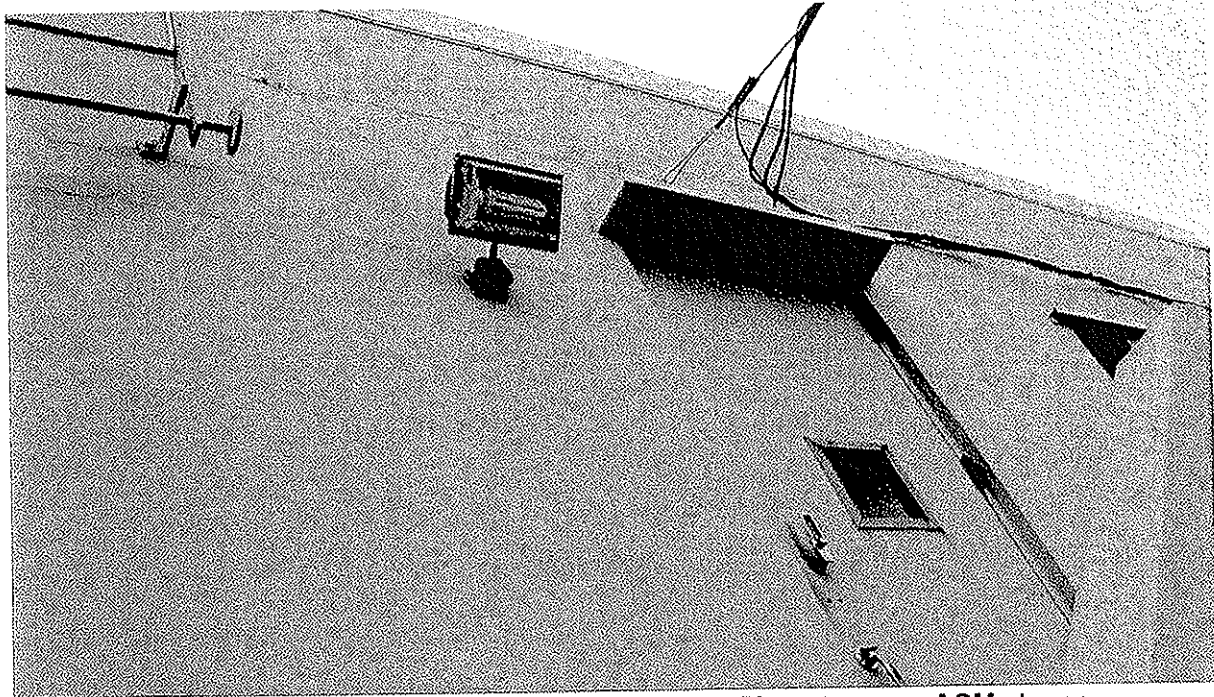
Alley side of Annex Building at 604 Simonton, nonACM stucco
